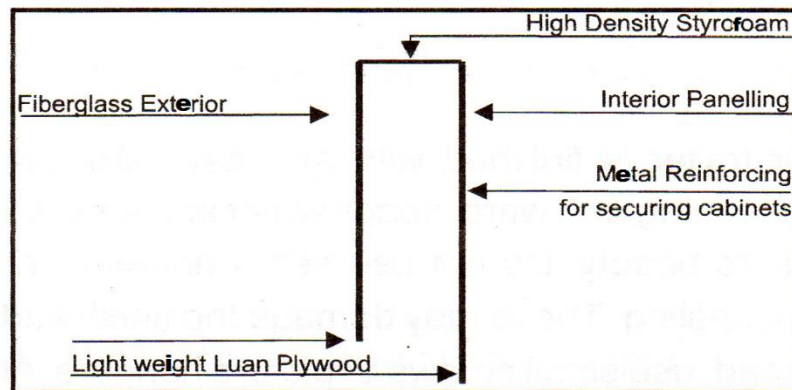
Wall Construction for Campers, Fifth Wheel Trailers and Travel Trailers
